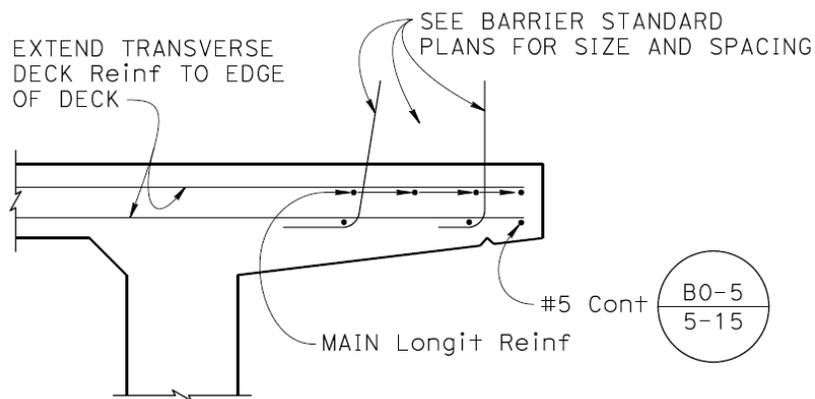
Barrier and Sidewalk Minimum Longitudinal Reinforcement
